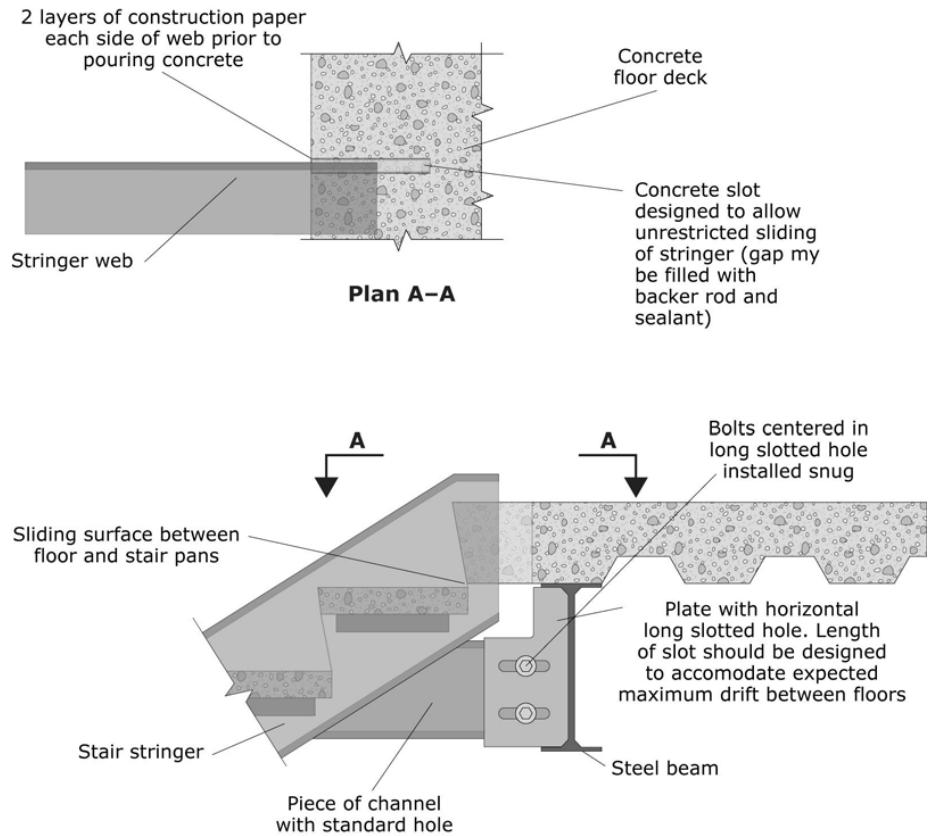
Example slip connection for steel stair stringer (ER).
